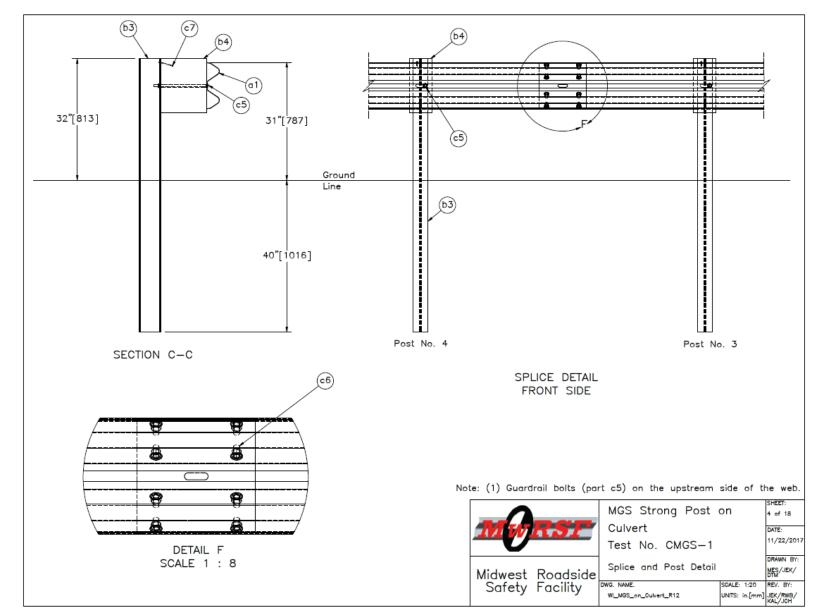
Splice and Post Details, Test Nos. CMGS-1 and CMGS-2
